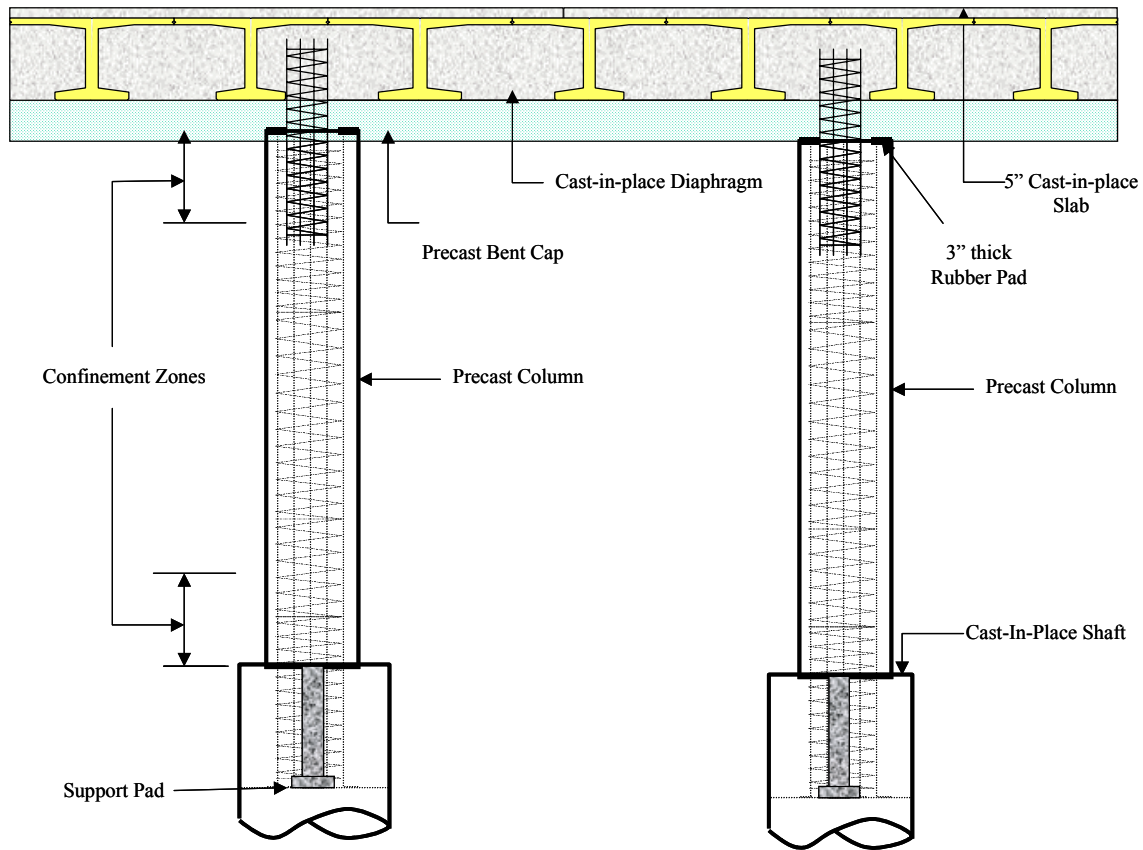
Precast Seismic Resistant Bridge with Decked Girders
